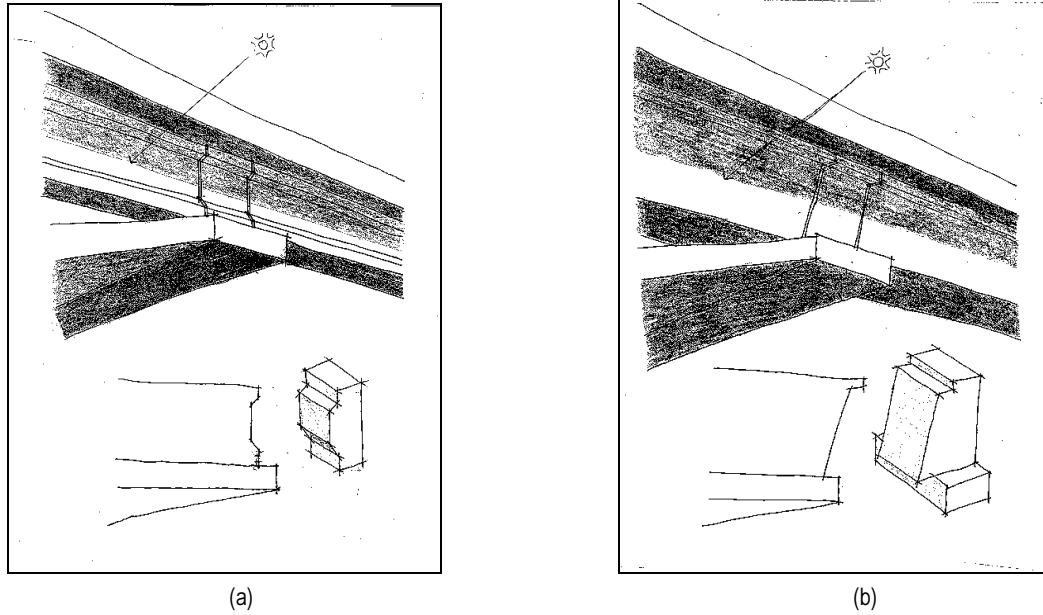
Bent cap ends formed to match the shape of concrete I-girders (a) and U-beams (b)
